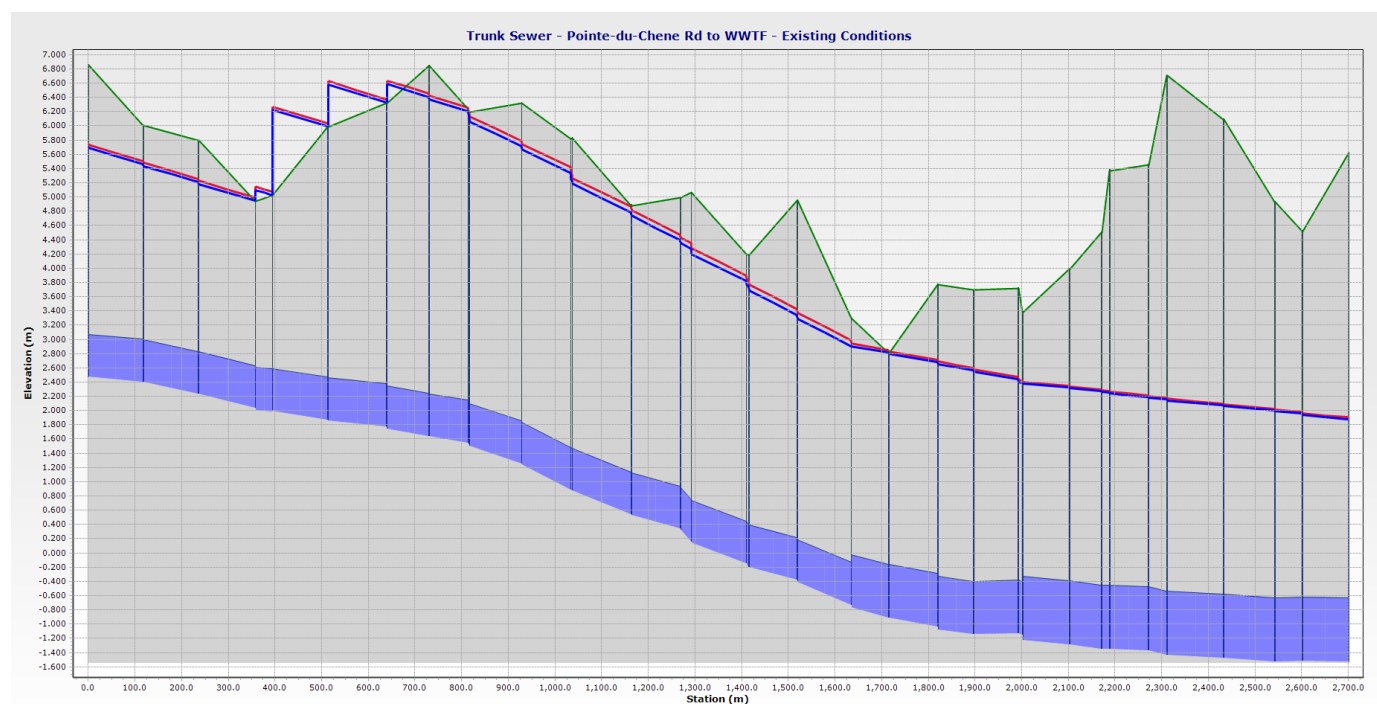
Existing conditions - Trunk Sewer HGL Pointe-du-Chene Rd to WWTF
